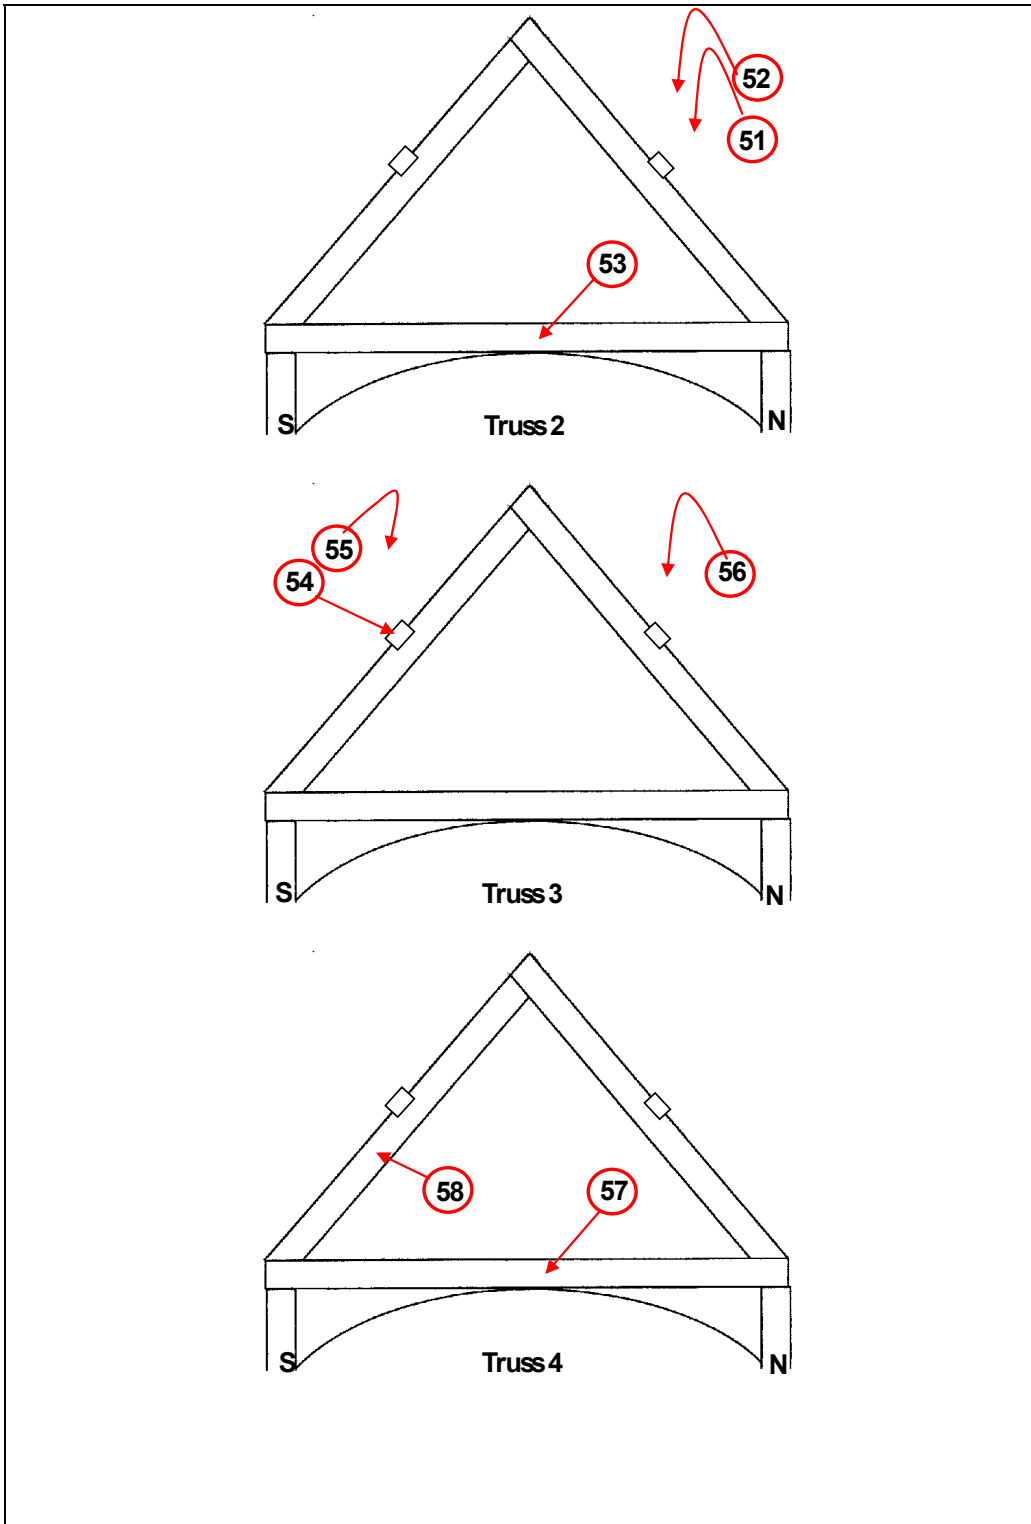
Trusses 2–4 of the north aisle roof to show sampled timbers
